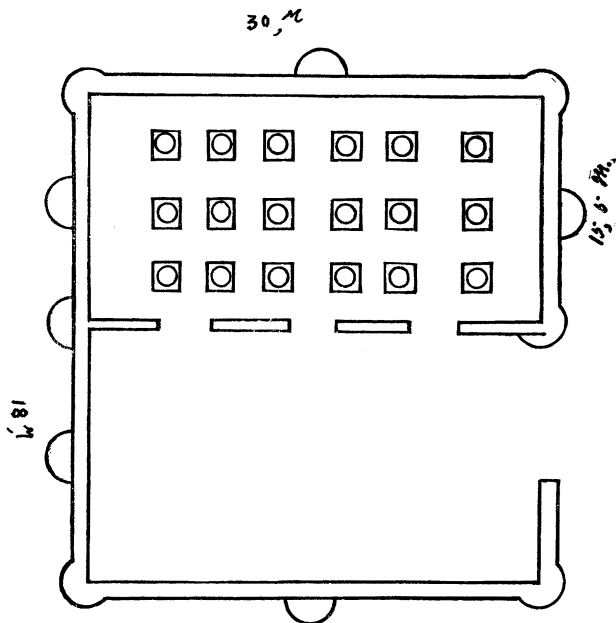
PLAN OF BRICK BUILDING WITH COLUMNS, AT ABU ADHAM.
